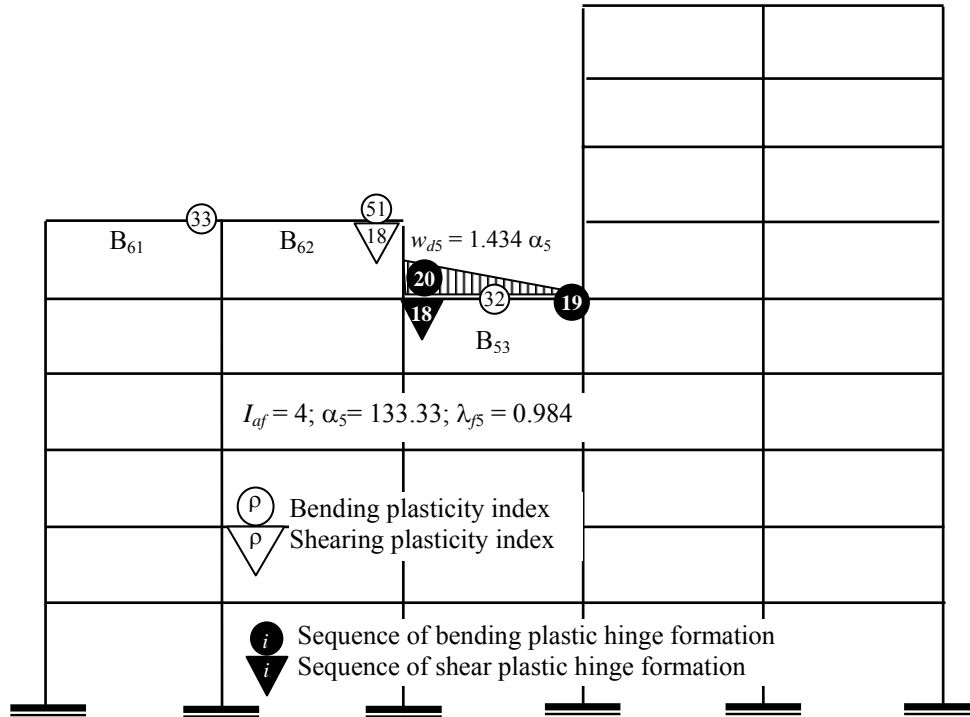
Example 2 (Los Angeles): Beam B₆₃ falls as debris loads and fails beam B₅₃ (Stage 5)
